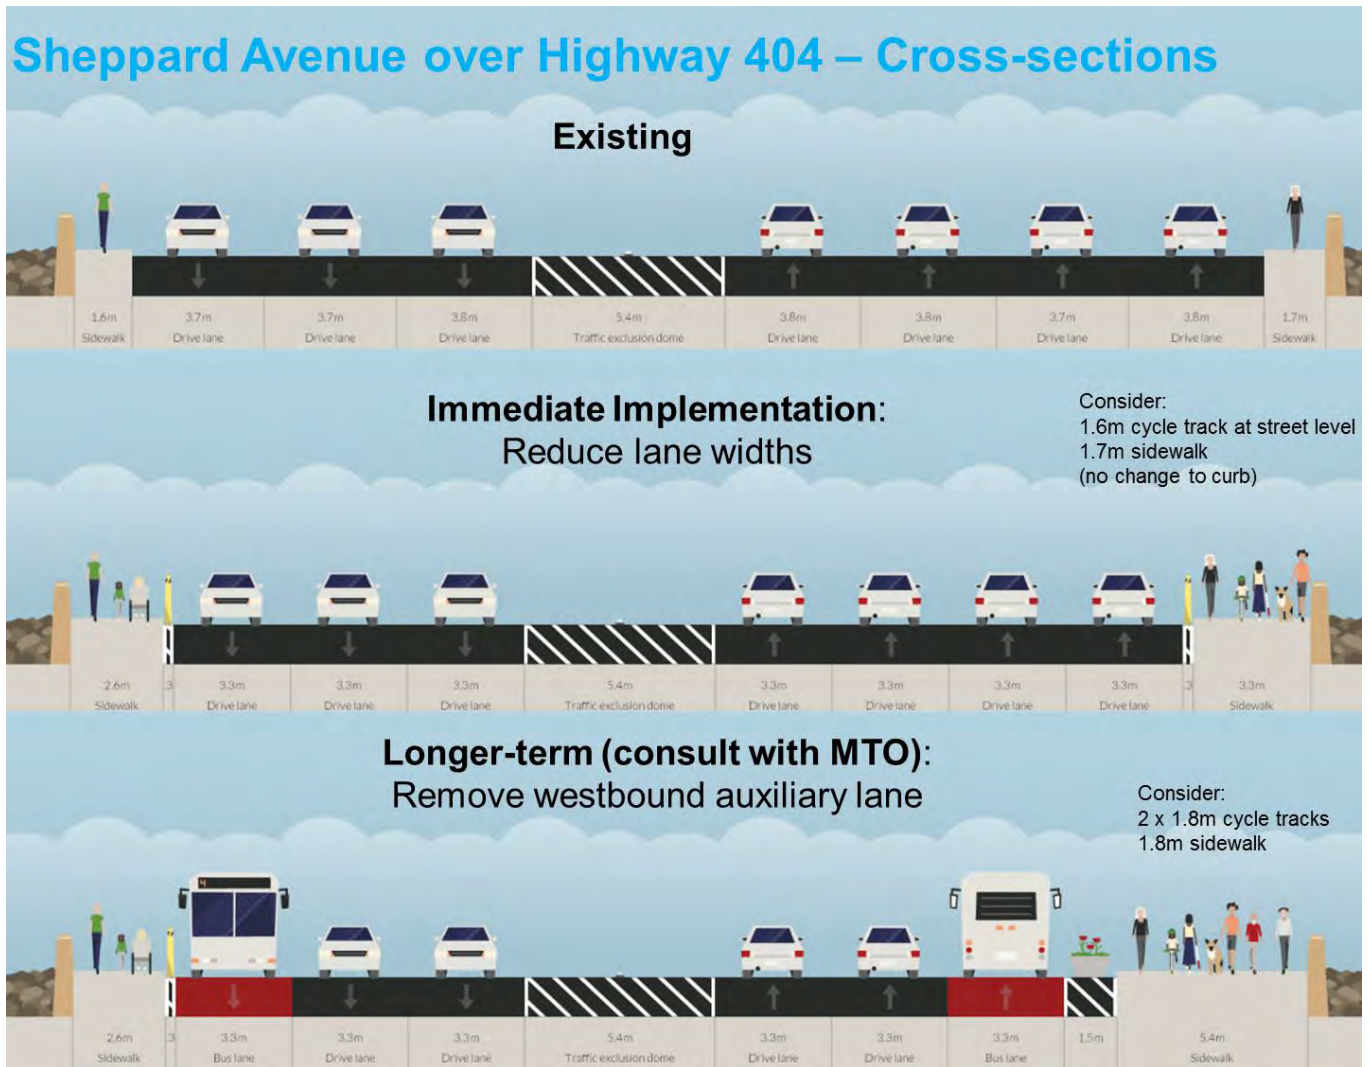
Cross-section Illustrations – Sheppard Avenue over Highway 404
